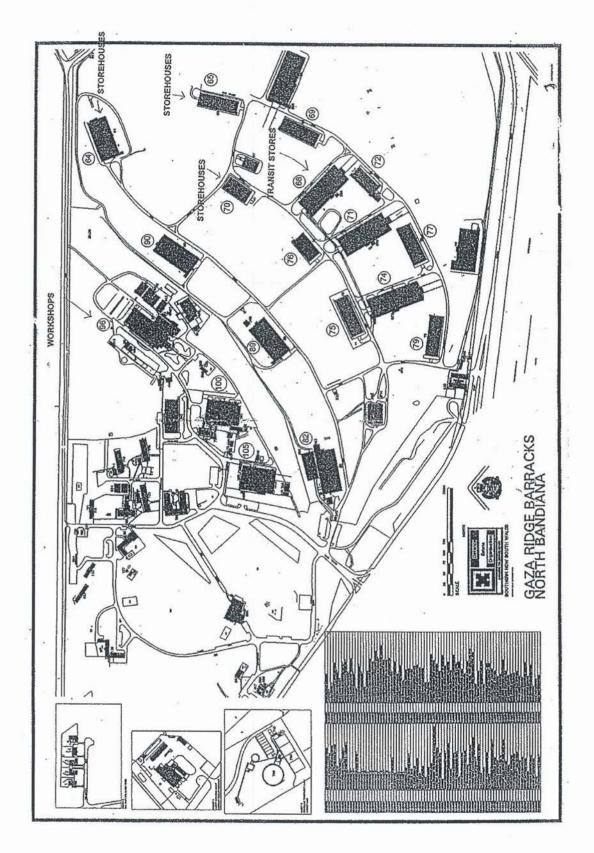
PLAN OF NORTH BANDIANA, SHOWING ARRANGEMENT OF STOREHOUSES AND WORKSHOPS
